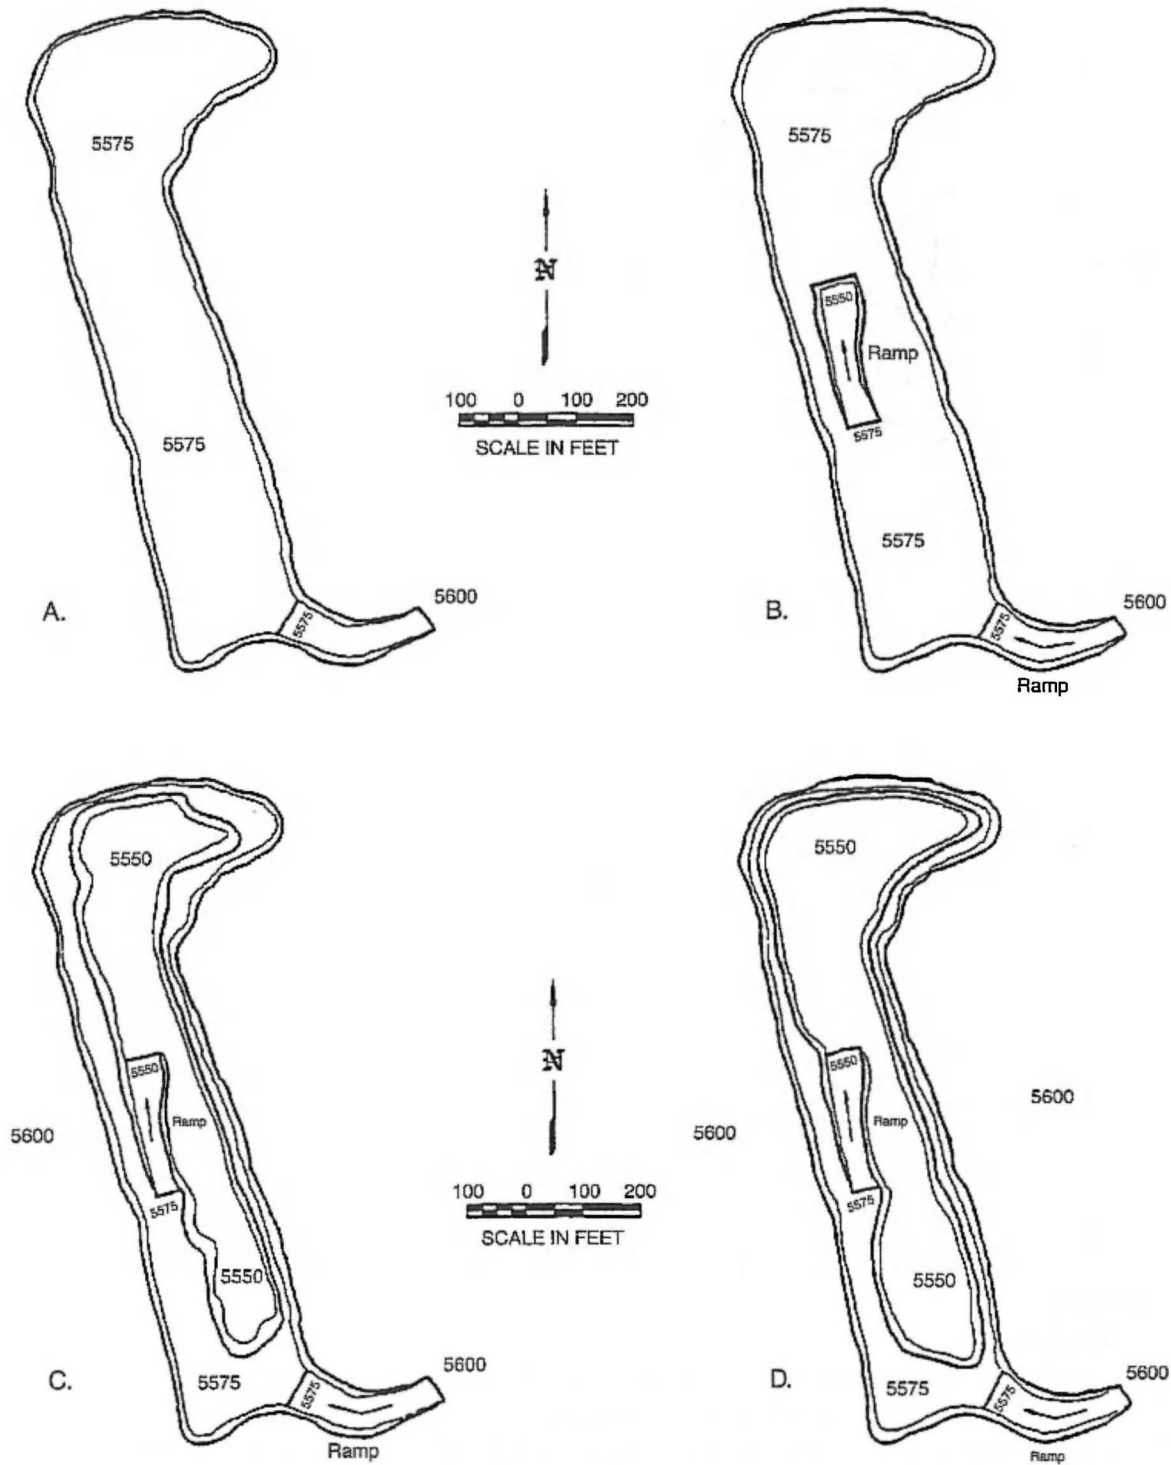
Plan view of an actual pit bottom showing drop cut and mining expansion (McWilliams, 1959).
